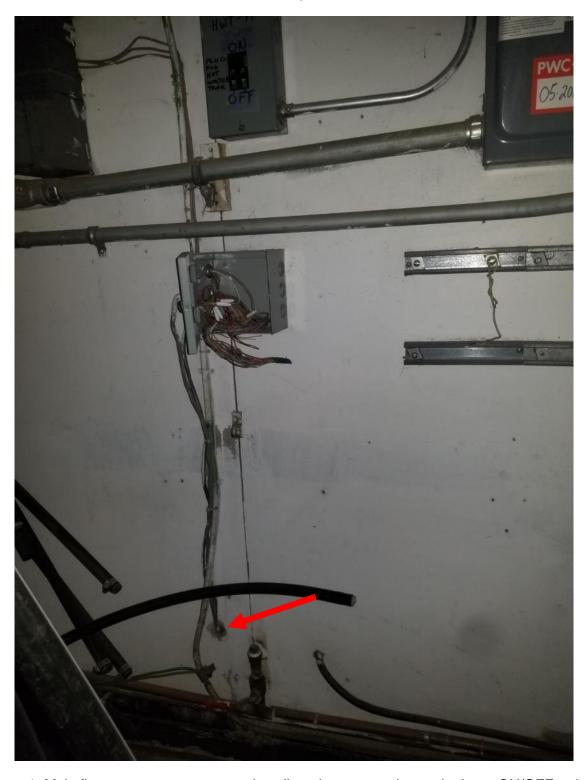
Main floor, storage room on north wall at pipe penetration under large ON/OFF switch, <1 square metre fair condition Transite on wall.
